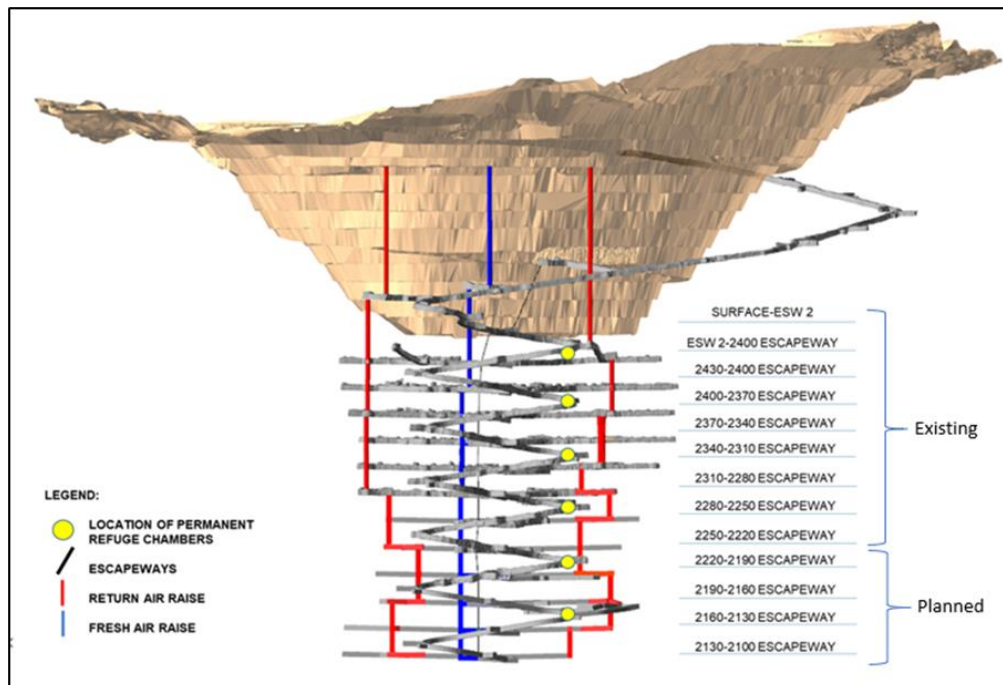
Didipio Existing and Planned Escapeway System and Refuge Chamber Location
